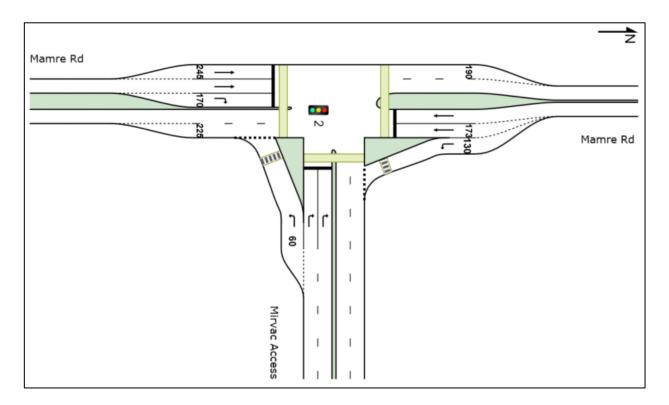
Revised intersection layout - Mamre Road / AIE site access
